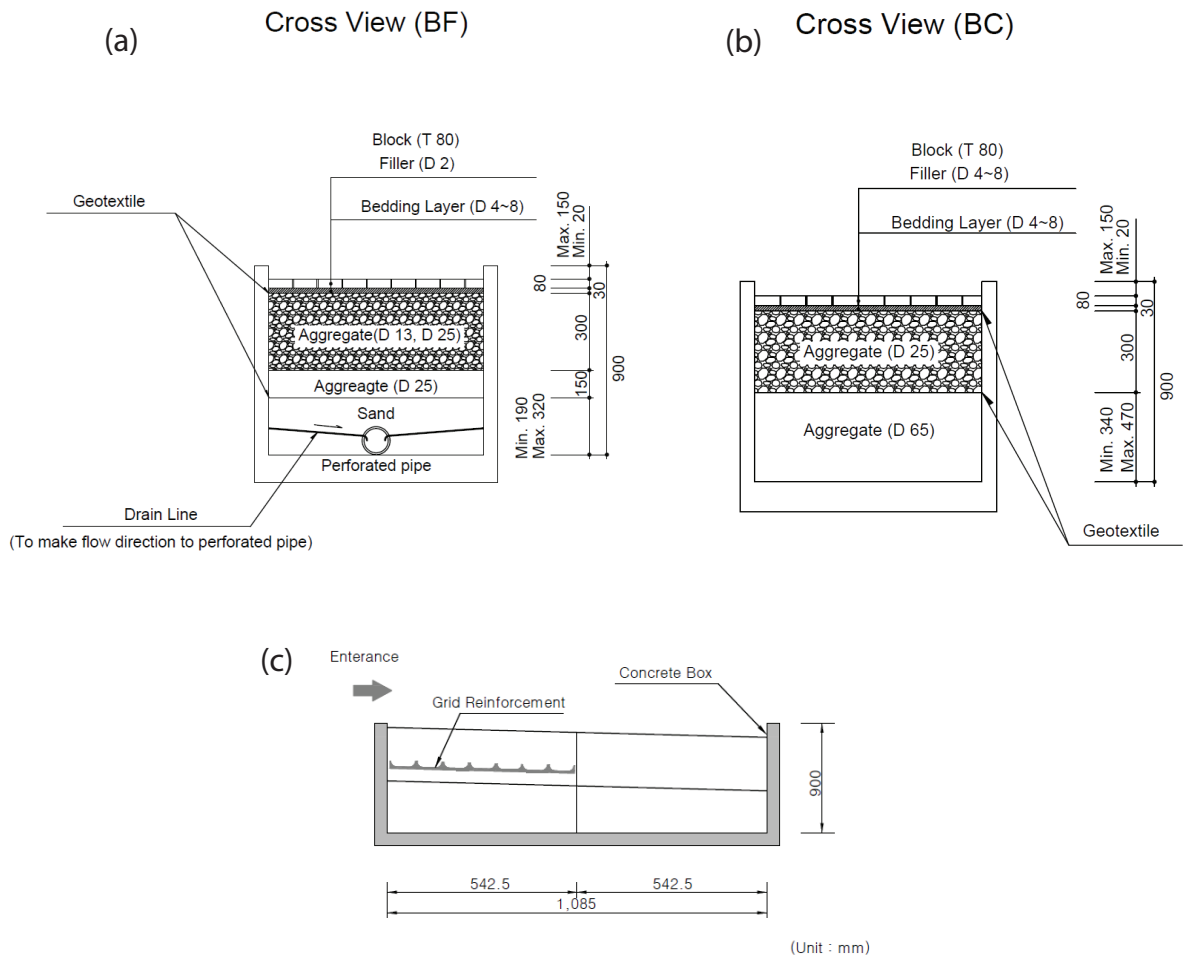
Cross section of permeable block parking lots: (a) BF cross section, (b) BC cross section, and (c) side section.
